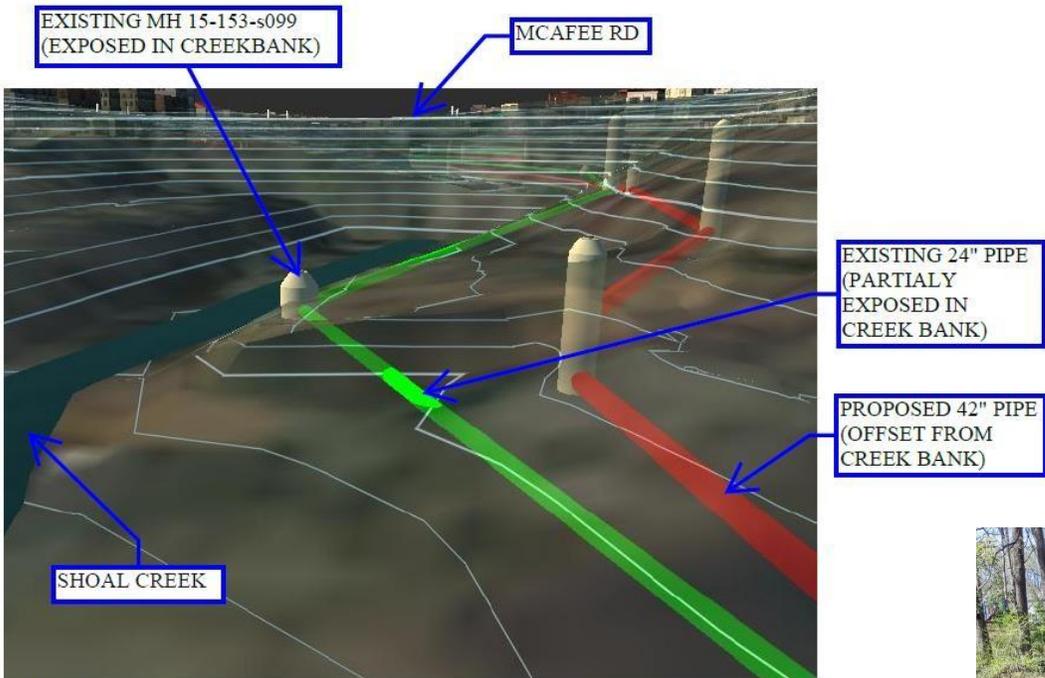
INFRAWORKS MODEL SNAPSHOT | 30% DESIGN | SHOAL CREEK SECTION IIIA
